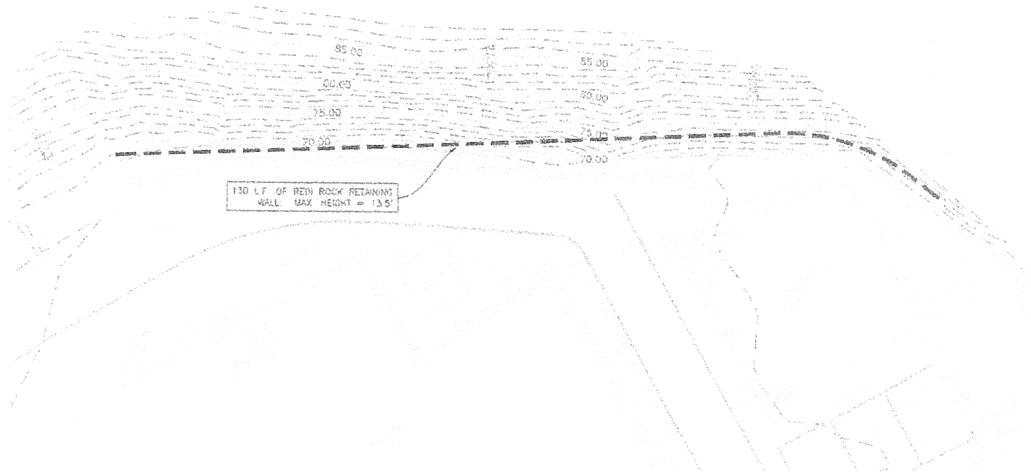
13.5' Redi-Rock retaining wall alignment with minimal setback.
